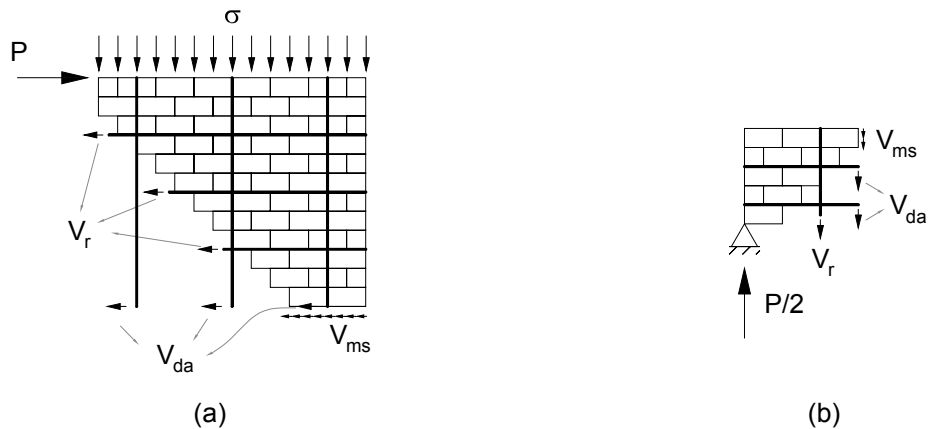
Shear resisting mechanisms of reinforced masonry elements: (a) shear wall and (b) masonry beam.
